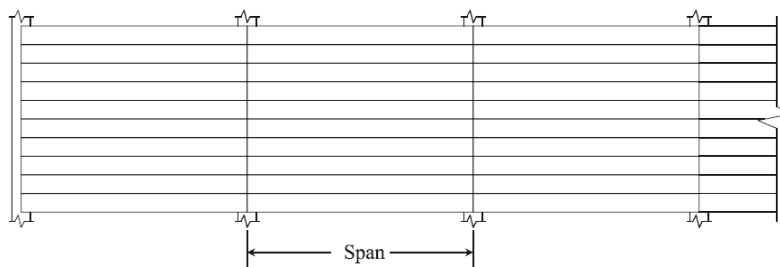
Simple Span Layup (Image from WCD 2 – Tongue and Groove Roof Decking)
